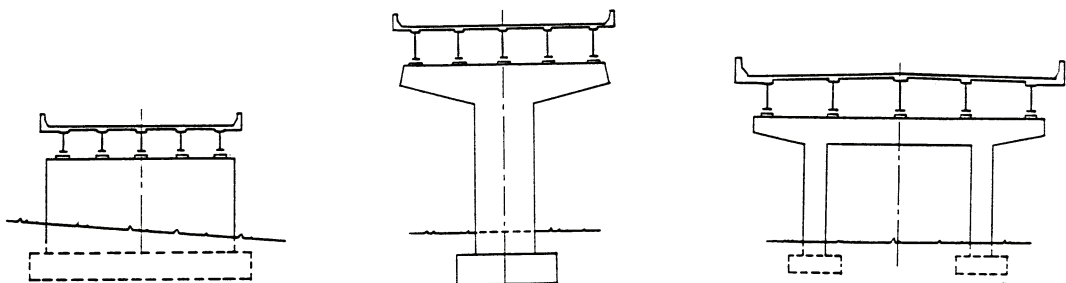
Typical cross-section shapes of piers for river and waterway crossings.
